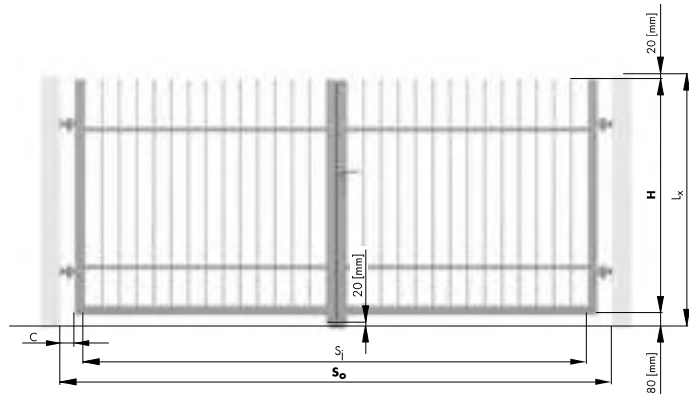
Gate: standard installation type (Classic, Vario, Style, Premium, Lux, and Modern systems with installation on concrete posts).
